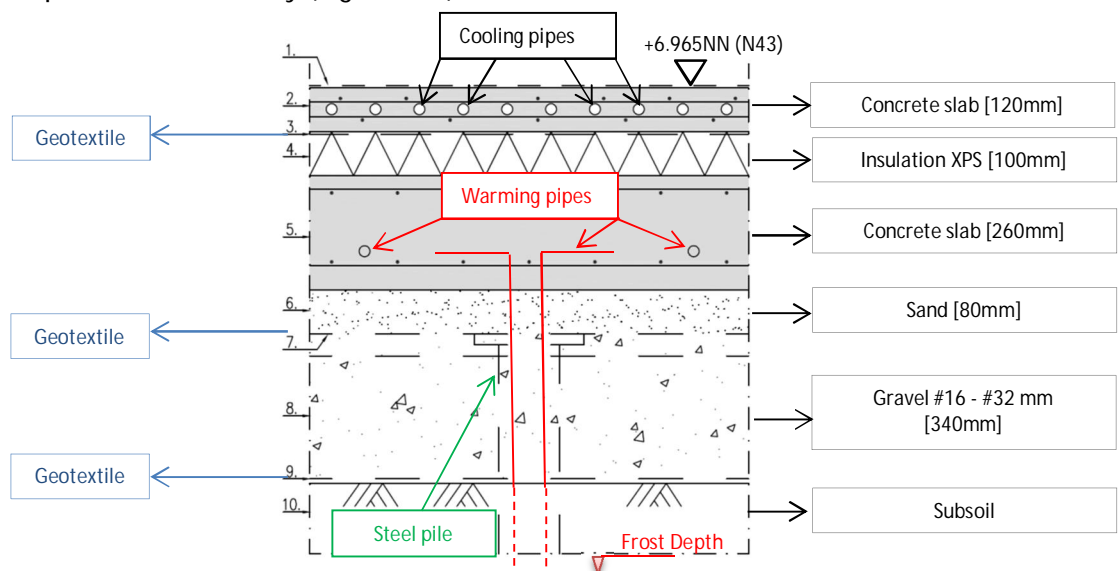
Cross section and material layers of the concrete slab designed in Myllypuro ice rink (Modified from Mehto, 2010)
